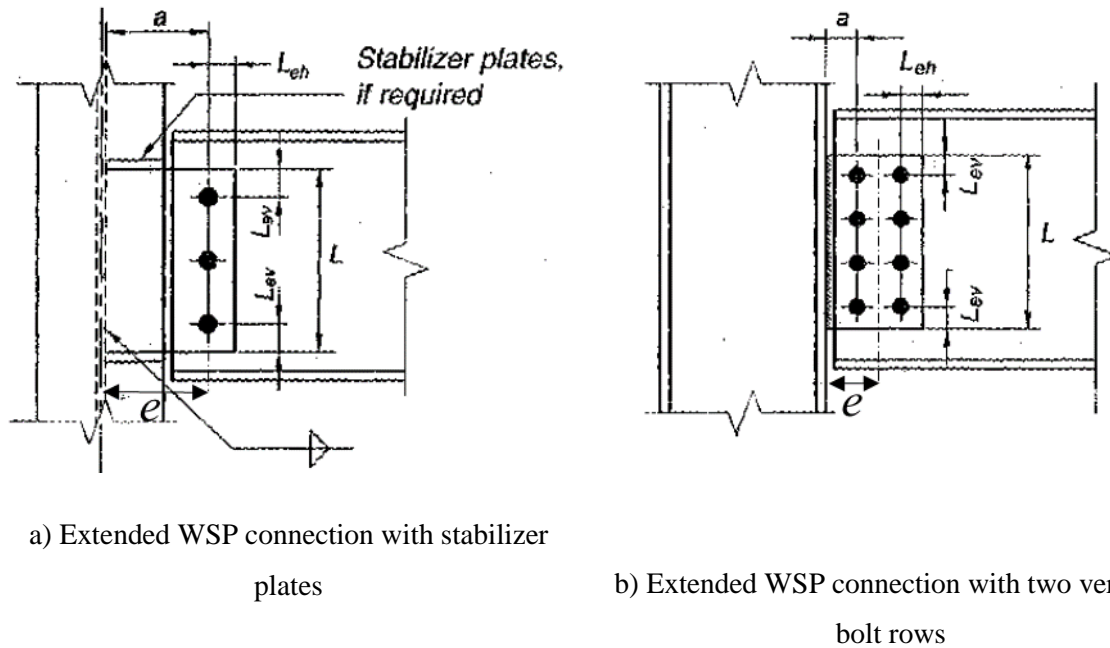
Extended WSP connection (AISC steel construction Manual 2011)
